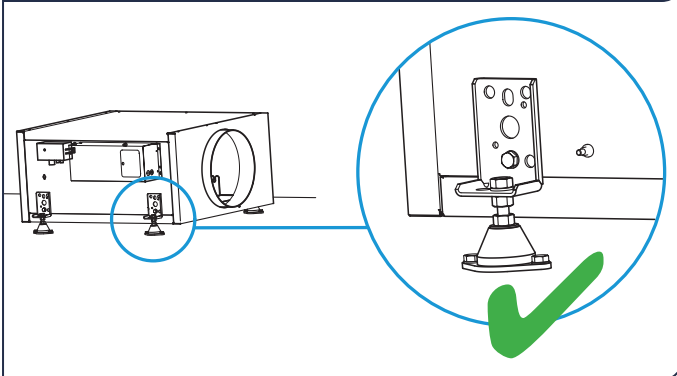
Correctly Installed NAV2-5 - Floor Mounted Application
